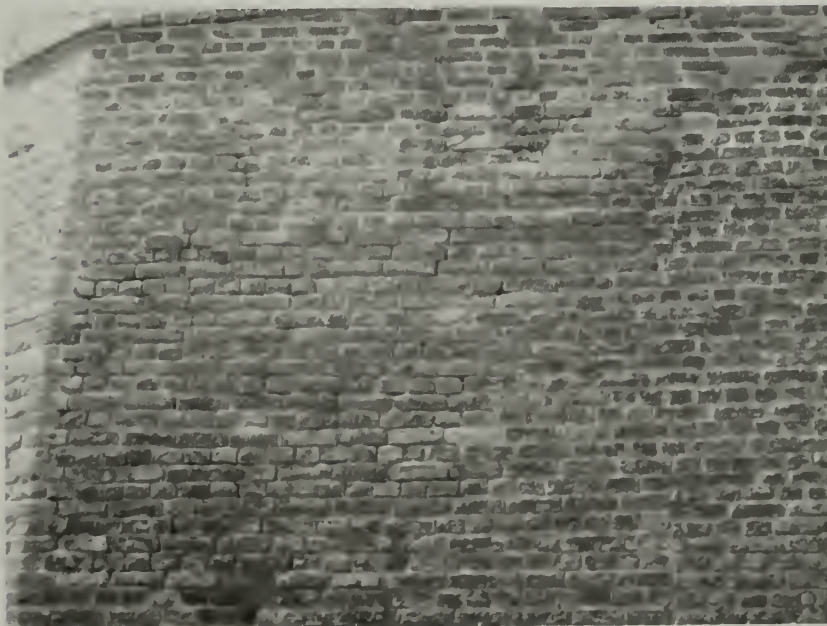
Fort Sumter, April 2009. East/Southeast elevation, area of open mortar joints.
